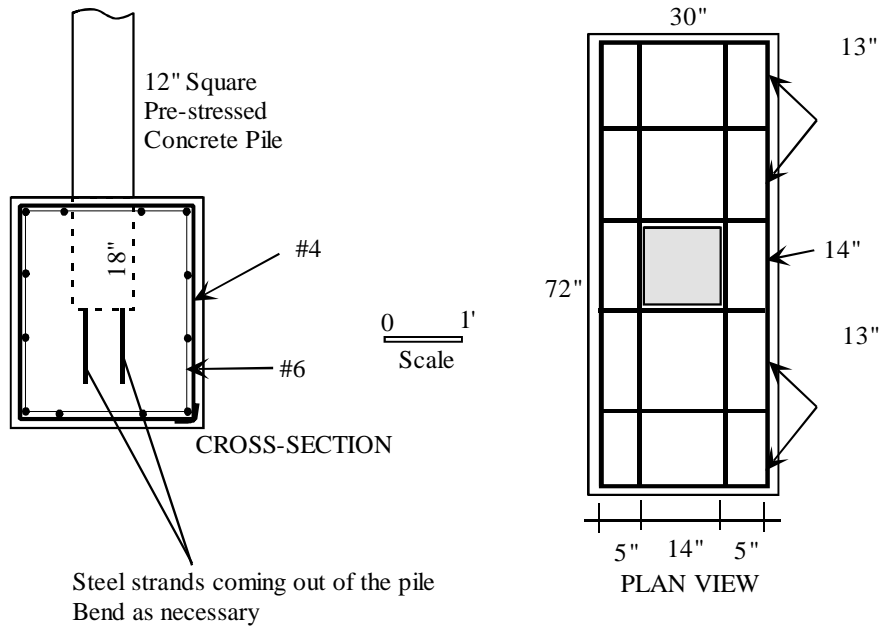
Reinforcement orientation of the pre-stressed concrete pile specimen
